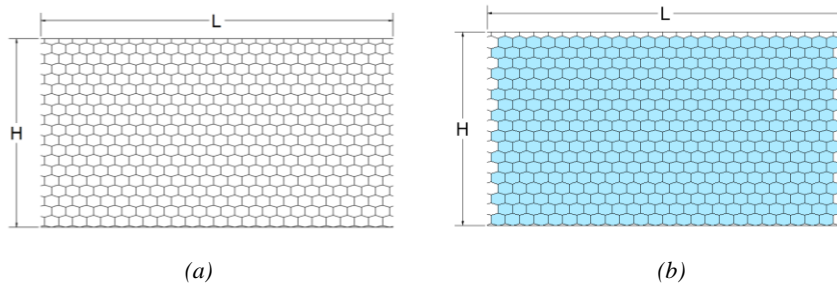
Shear wall configurations: (a) unfilled steel honeycomb shear wall panel, (b) fully filled shear wall panel
